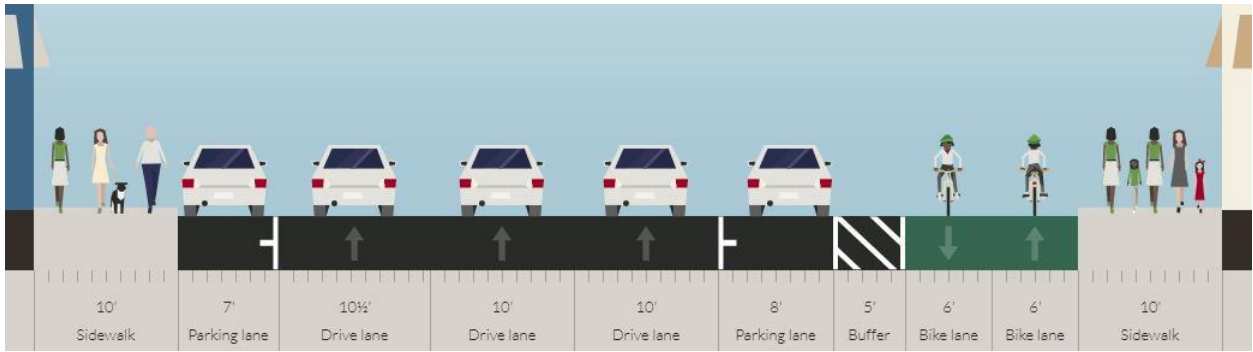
Typical Cross Section of Folsom Street between 11th and 10th streets, looking east
